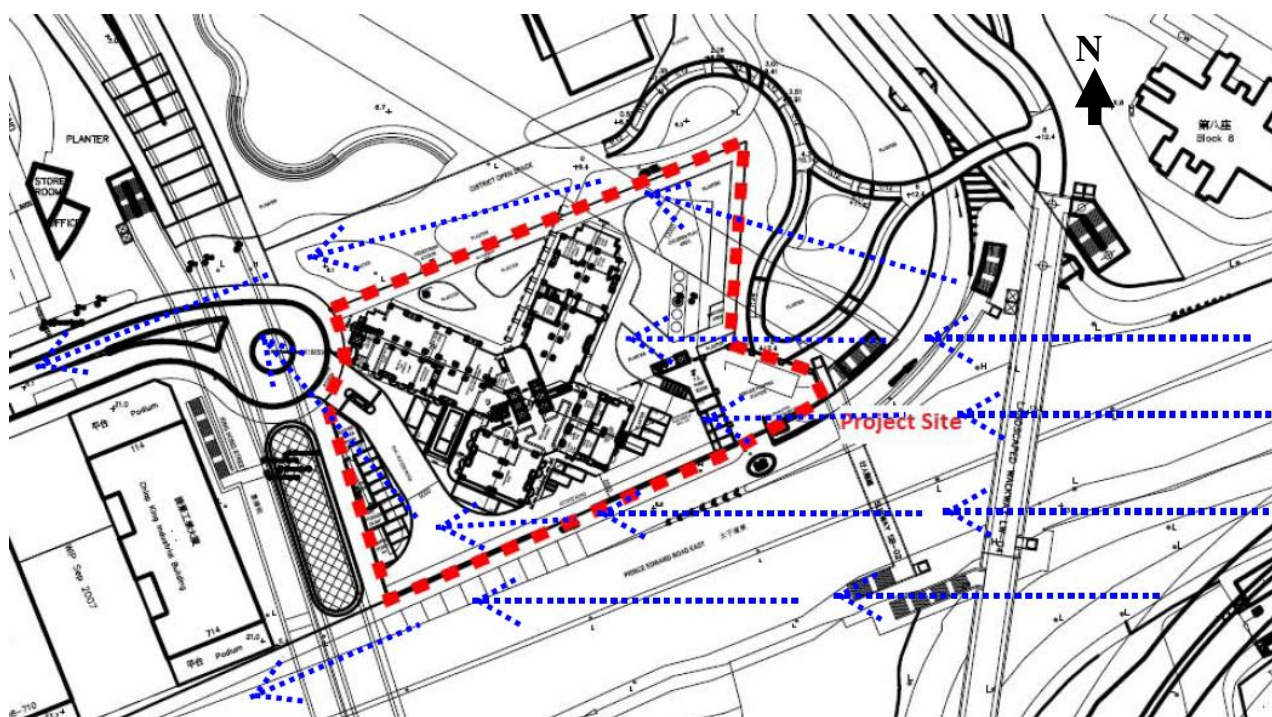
building orientation to enhance prevailing E wind penetration from the south part of project site
